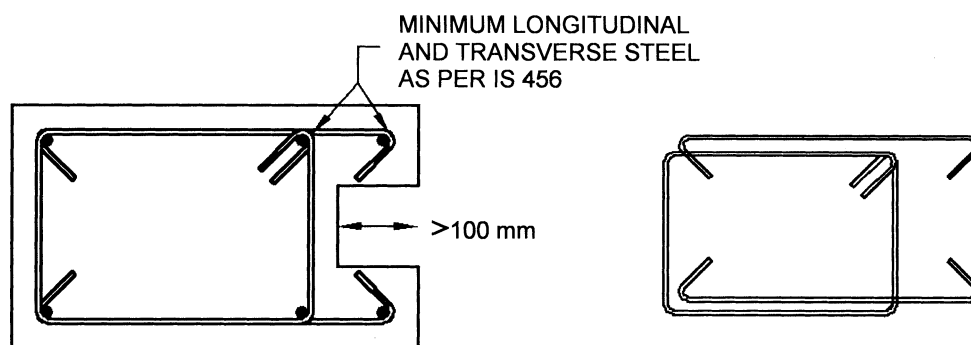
REINFORCEMENT REQUIREMENT IN COLUMNS WITH PROJECTION MORE THAN 100 MM BEYOND CORE
